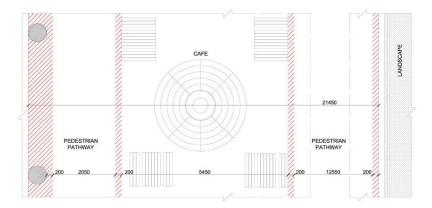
Street width and buffer spaces (in mm) for Gateway 5 in the area surrounding Darmstadt Hauptbahnhof
